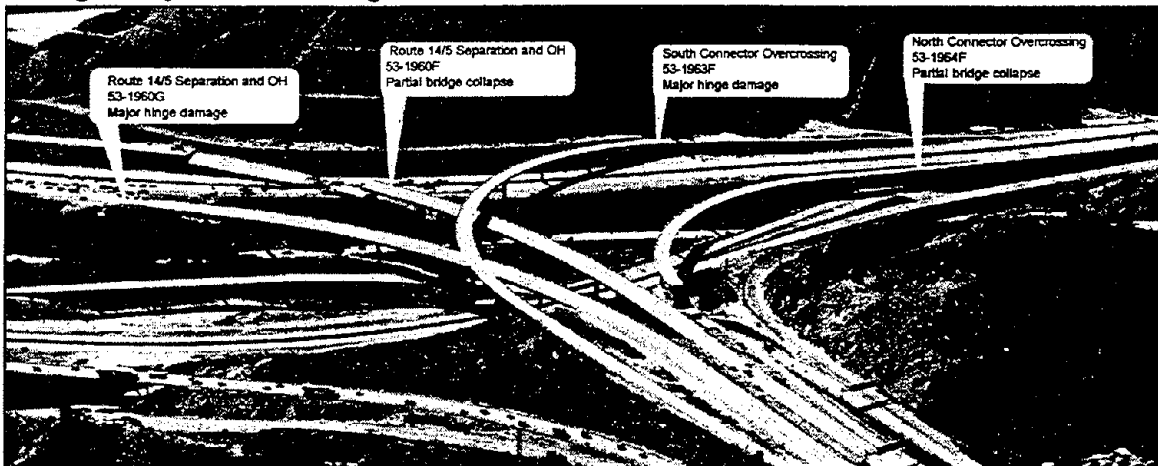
Bridge Damage at Location #2 - Route 14/5 Interchange.
